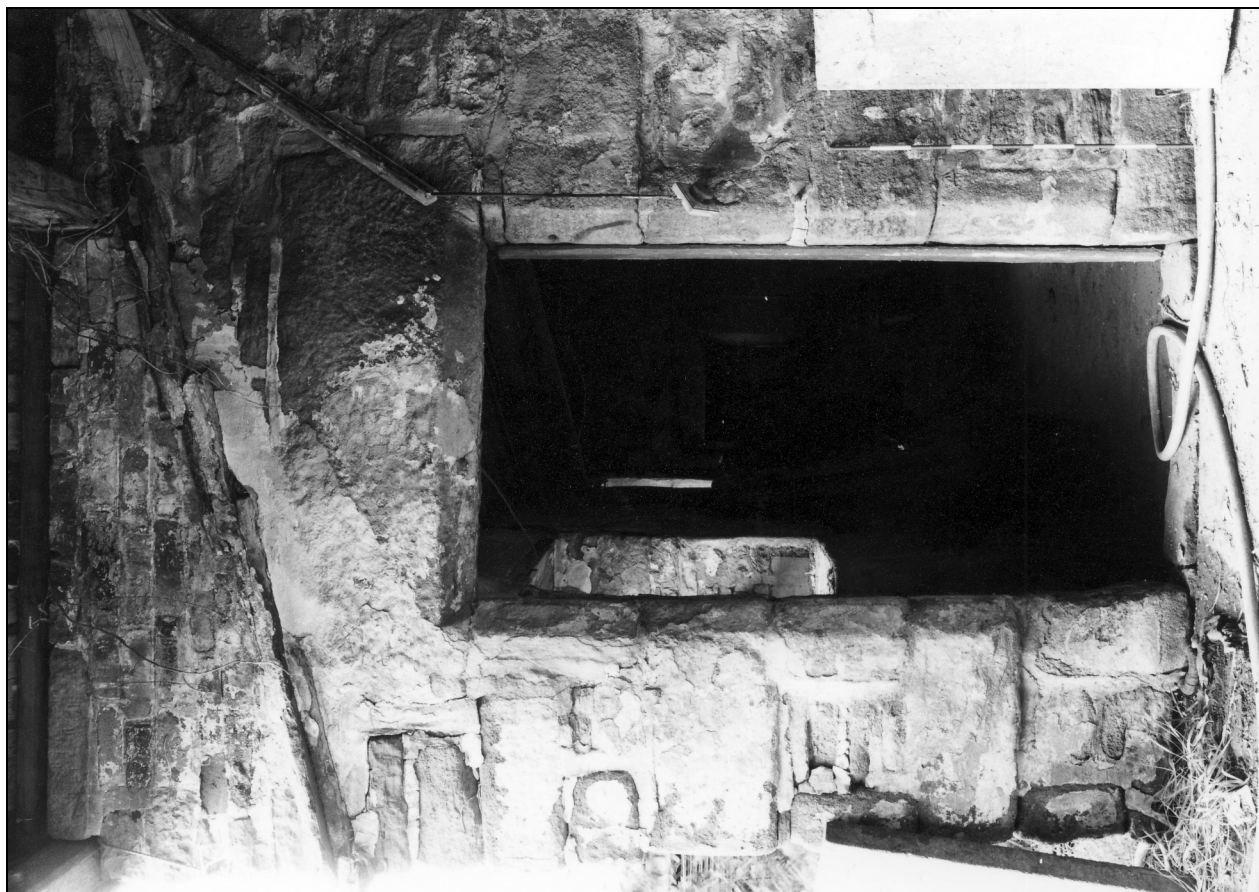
Doorway to shippon in south-west outshut (film 2, frame 13)
